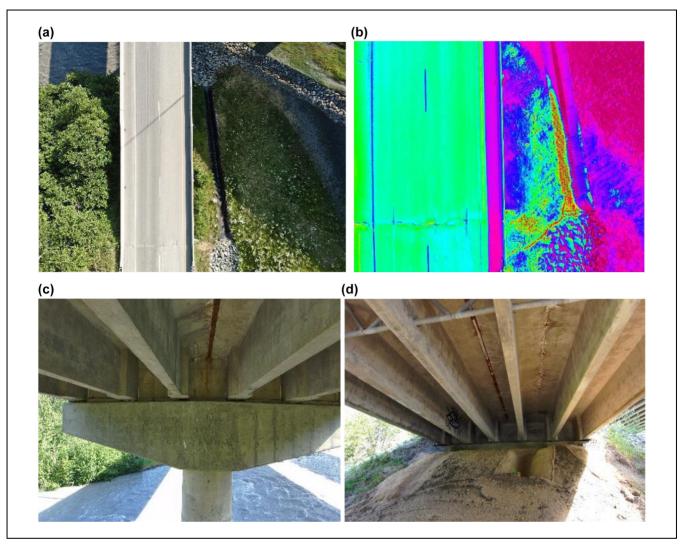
Aerial inspection of the 1341 bridge elements: (a) RGB image of bridge deck, (b) infrared image of bridge deck, (c) aerial inspection of pier cap, and (d) aerial inspection of abutment on Palmer side.
